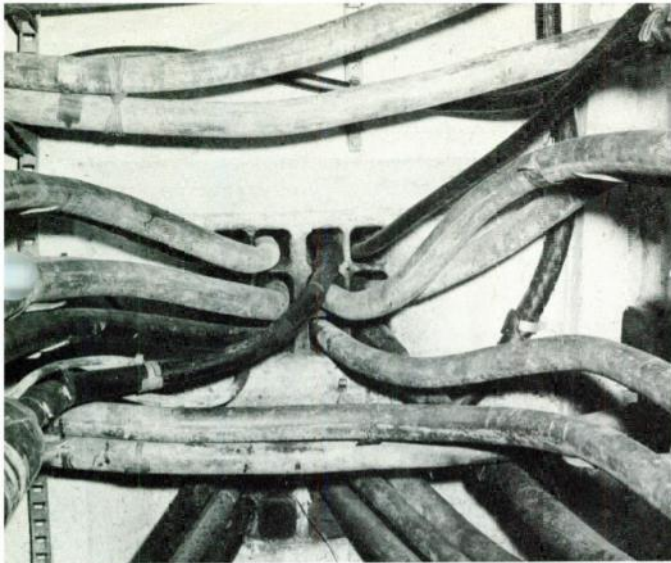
Typical manhole in metropolitan area. When all cable ducts become filled, additional circuits may be obtained by adding new conduit, replacing old cable with finer gauge, or by using carrier.
